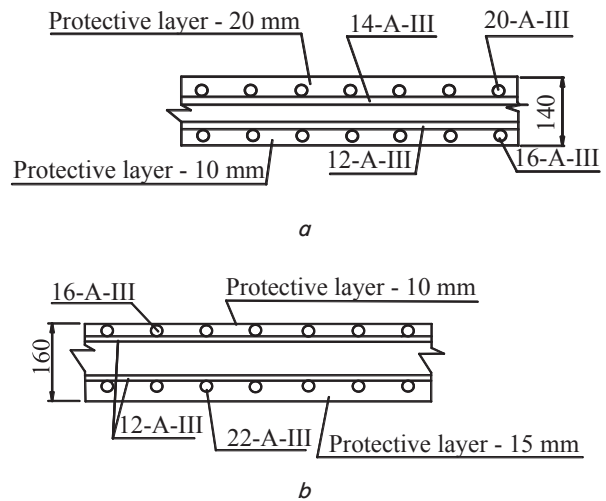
Schematic of reinforcement of the reinforced-concrete slabs: a – stack-deck; b – bottom
